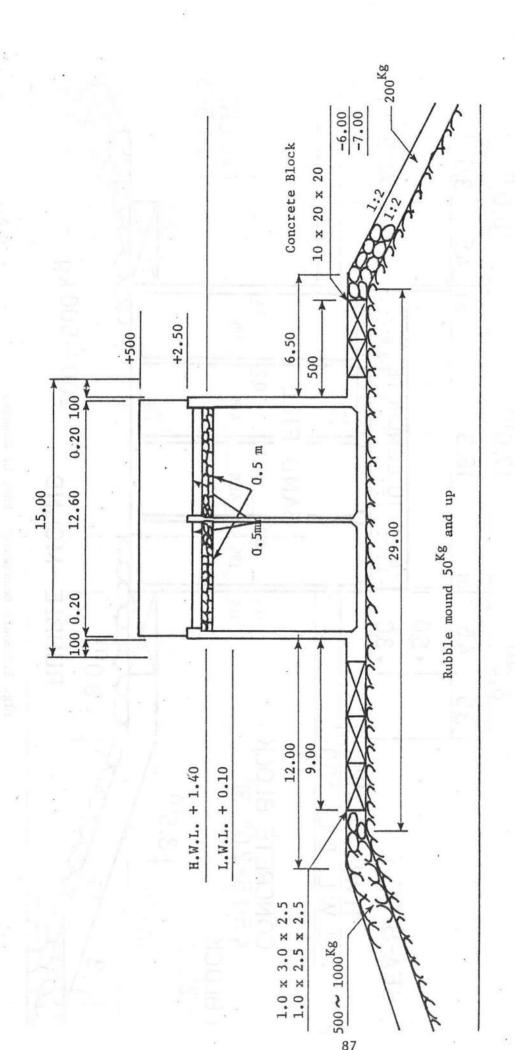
Hachinohe Harbor Breakwater Typical Cross Section
